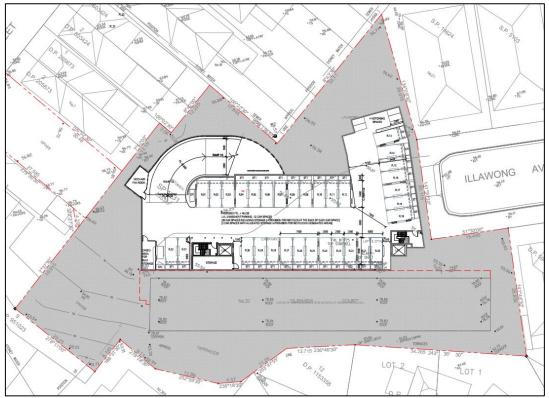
Extract of B3 Basement Floor Plan – 20 Illawong Avenue, Tamarama Source: Group GSA
